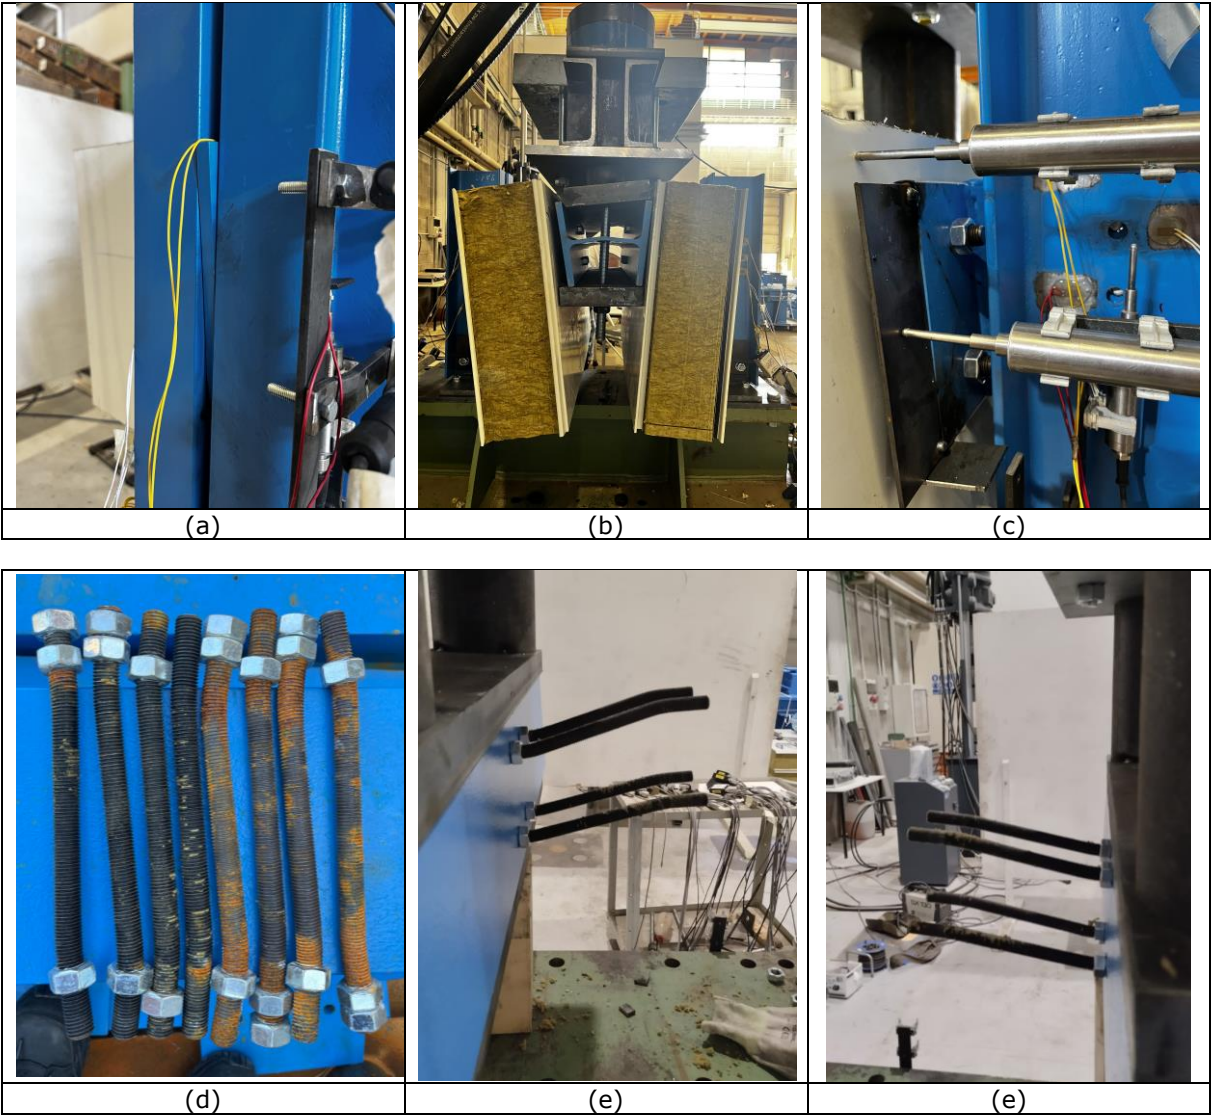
Detail 4 at failure: (a) lateral view of T plate element rotation under tension force; (b) frontal view of sandwich panels and HEB180 element under compression force; (c) movement of sandwich panel and T plate elements after cyclic test; (d), (e) and (f) details of the rods after the compression test
